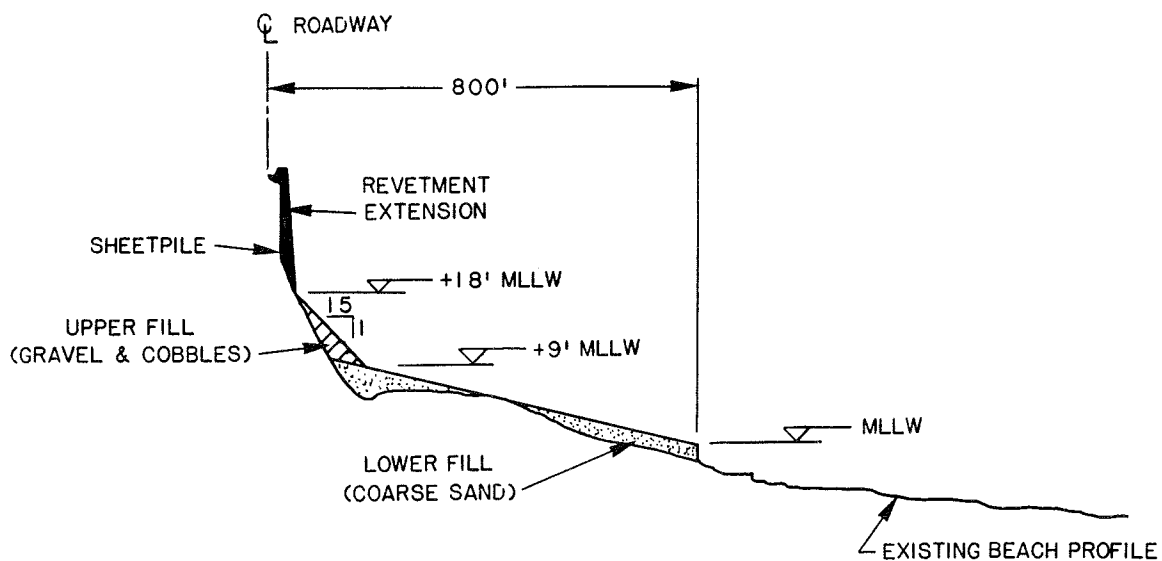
Typical cross-section of Alternative 2 composite beach fill with revetment extension
